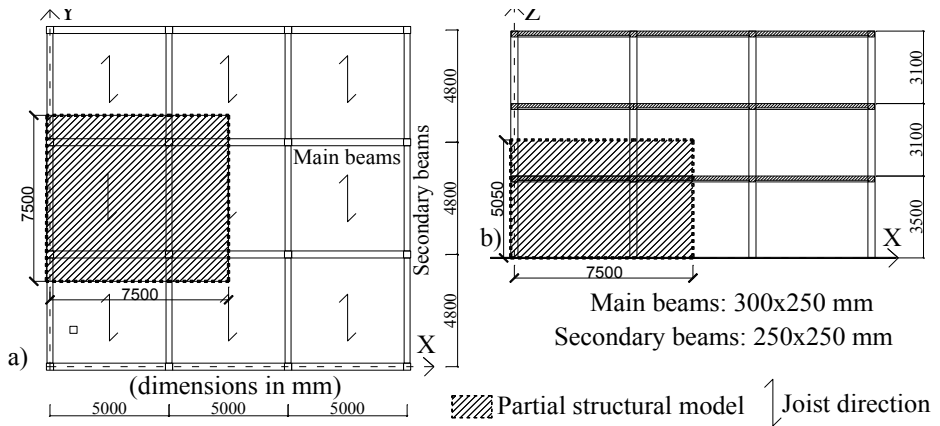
Prototype structure (units: mm): a) plan; b) elevation
